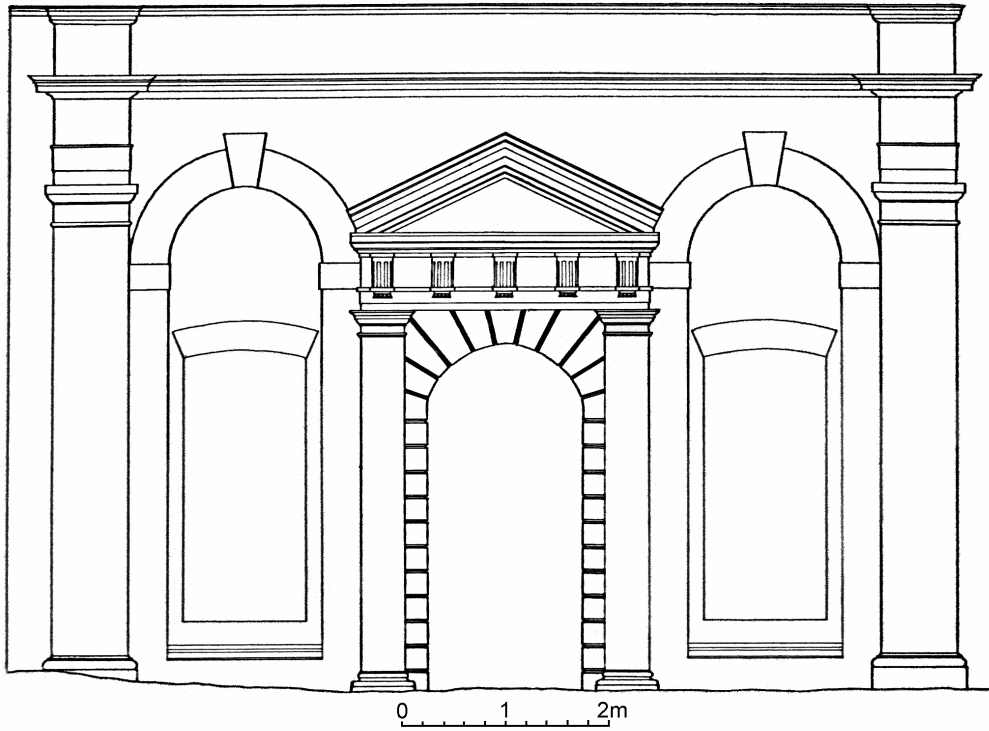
Reconstruction drawing of the Orangery wall bay 1.
